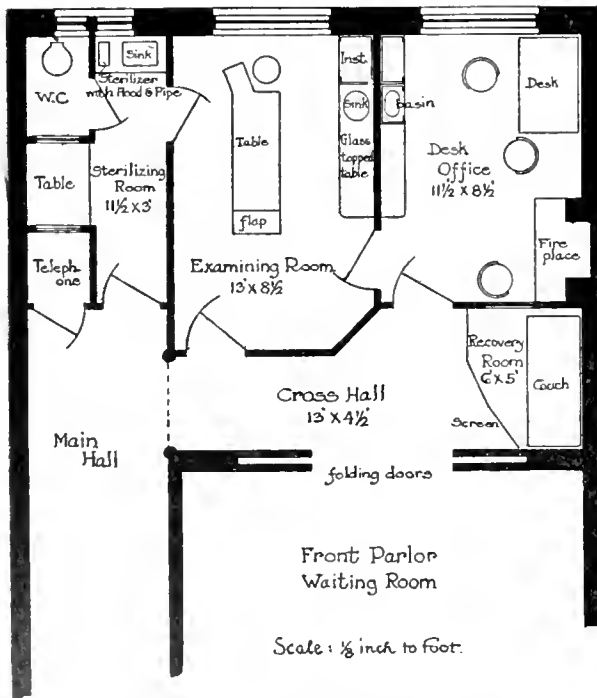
Ordinary 25-ft. city house without extension, altered for offices. The cross hall is not well lighted, but has a window near the recovery couch. The cross hall has been widened to give room for couch. The toilet is fairly accessible. Pipes should stand clear of rear wall to avoid freezing. In all these plans the telephone has been placed in a closet or booth when feasible because a physician's telephone talk should not be overheard. There may be a desk set also. Doors are seen to open awkwardly, apparently, but really in order to screen the patient when the doctor is called to receive a message.
